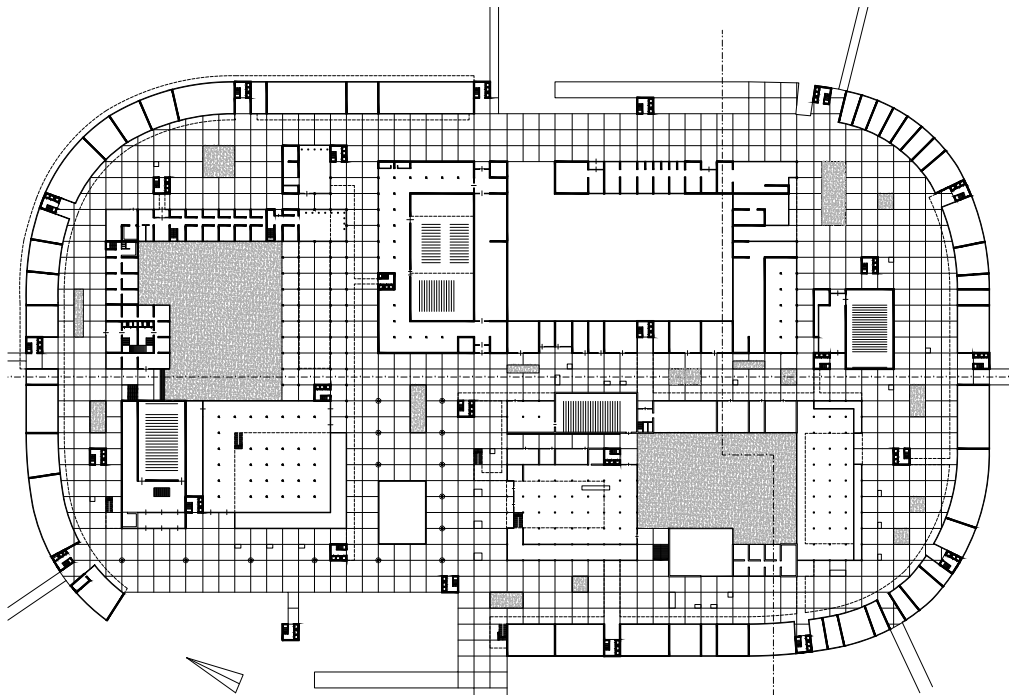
Re-drawn floor plan (Image: Eva Sollgruber).
